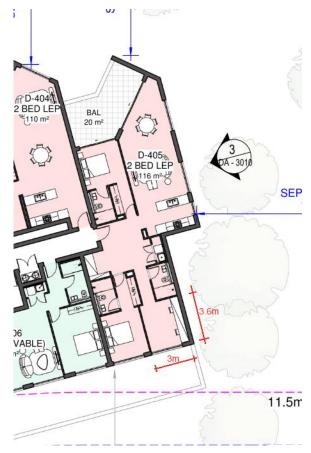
Typical Floor Plan of Unit D-405, D-505, D-605
